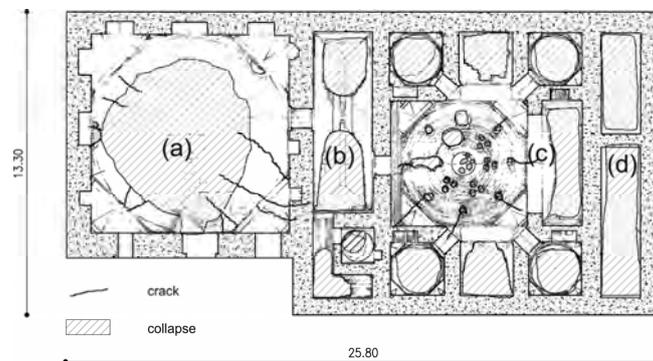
Ceiling plan: cracks and collapses are denoted.
